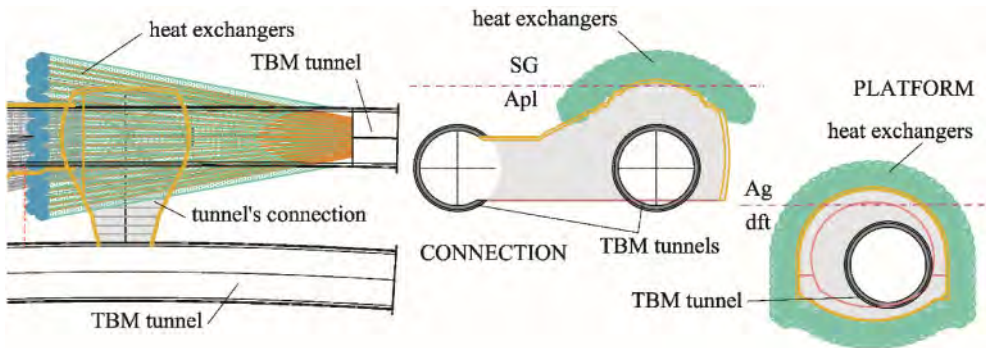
A planimetric view (left) and a transversal section (right) of the artificial ground freezing for the connection between two tracks.
